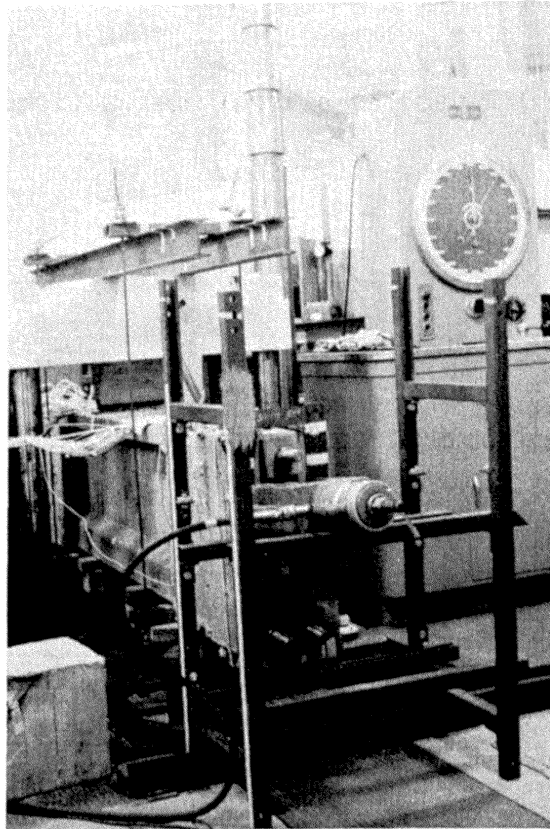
Model Beam in Testing Machine - Viewed from Near the Short End.
